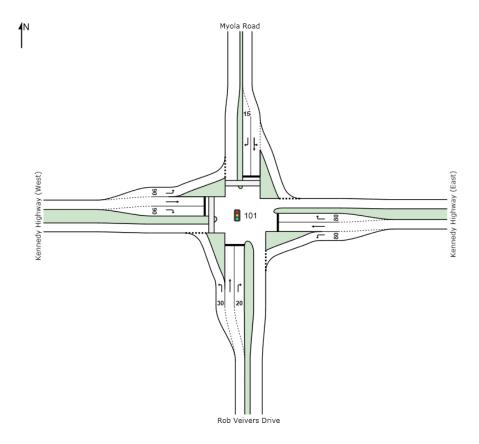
Kennedy Highway / Myola Road / Rob Veivers Drive intersection layout
